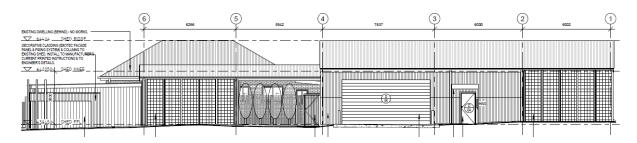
Proposed Maud Street Elevation, the New Shed is to the right of frame with the Proposed Maud Street Access, Elevational Treatments to break scale and provide visual interest include Planted Steel Trellis and Decorative "Ecotech" Façade Panel System -TLA
